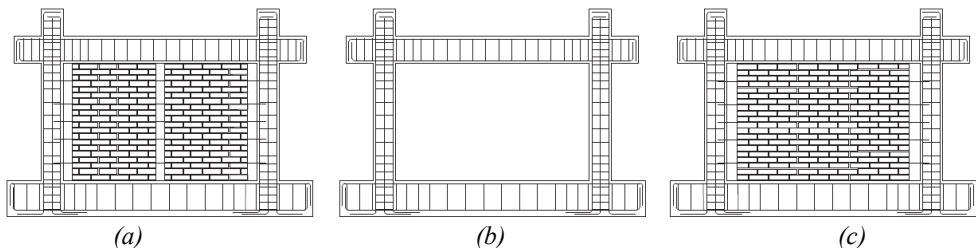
front view of different infill's configuration for slitted wall (a), bare frame (b), and isolated column (c)
